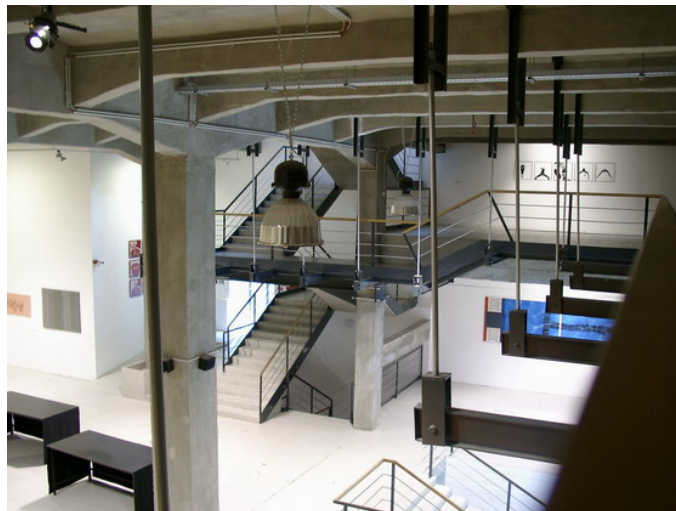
New reinforced concrete floor built in an existing reinforced concrete structure
